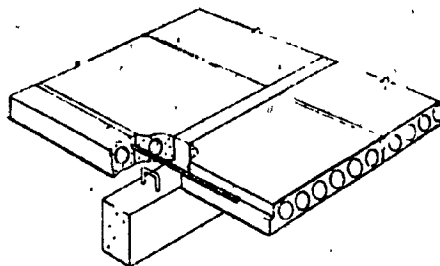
Welded Tie Connections between Adjacent Slabs.
